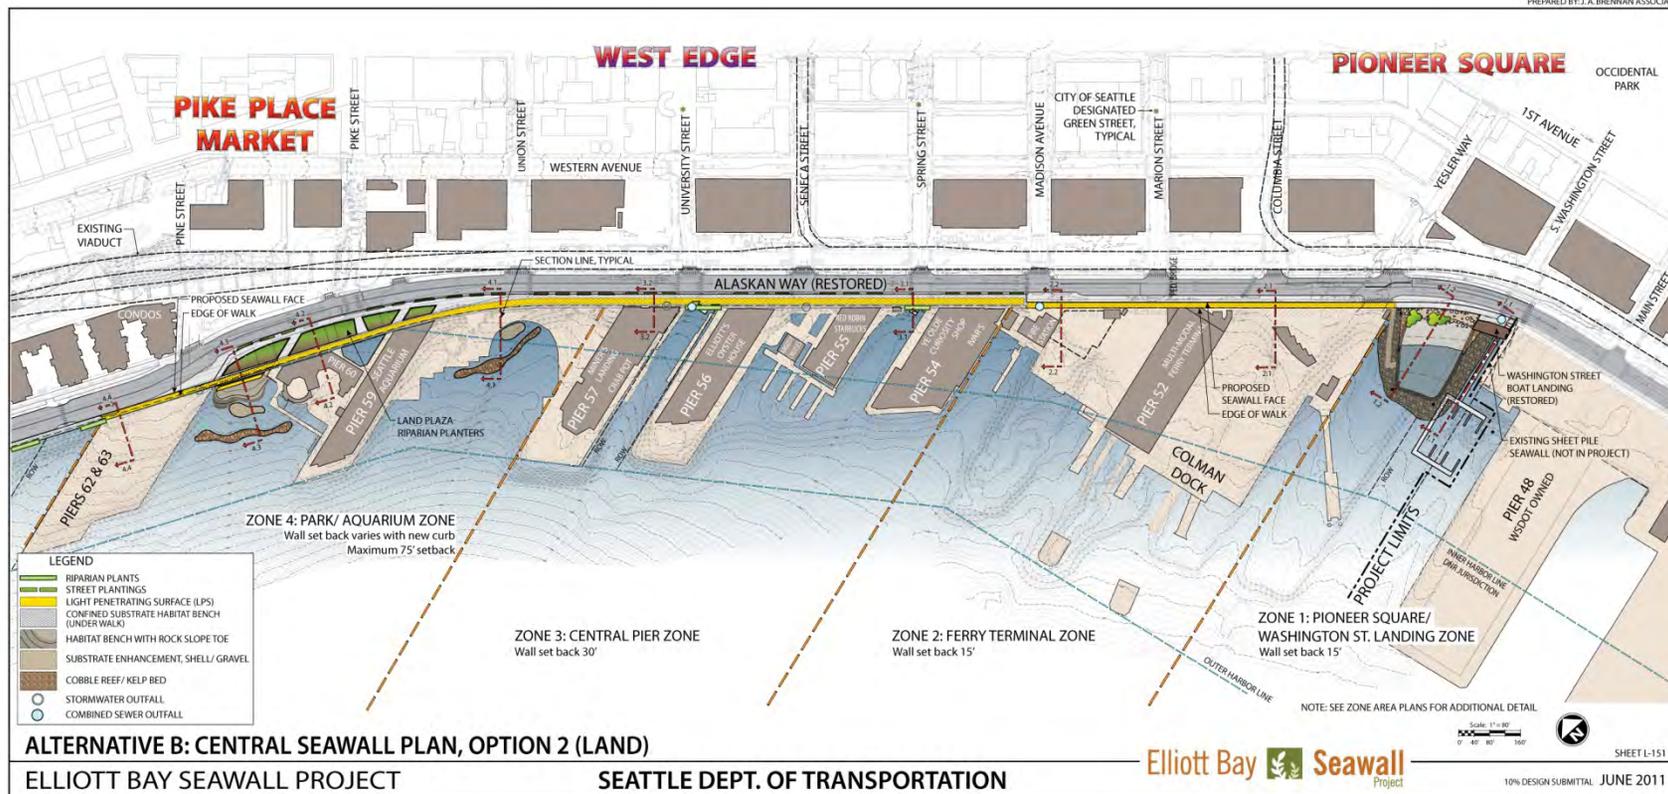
Alternative B: Central Seawall Plan, Option 2
